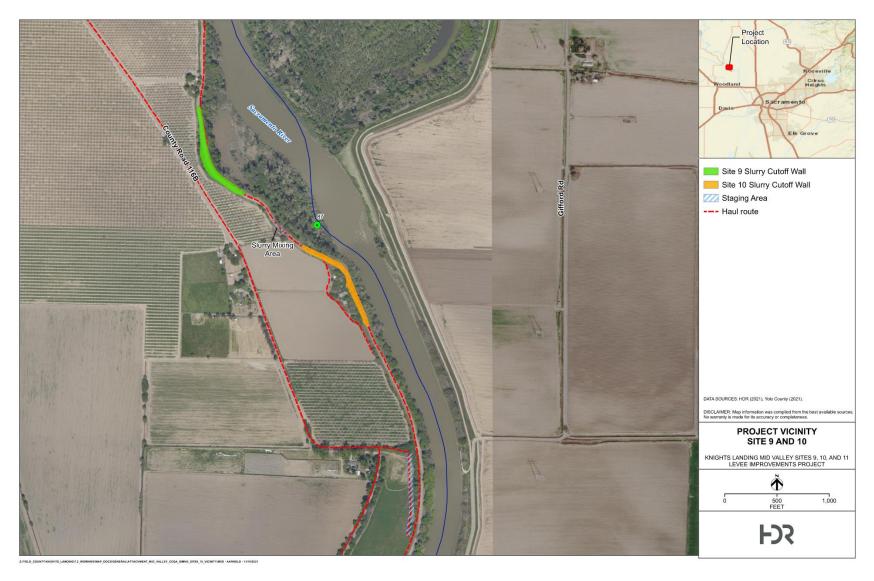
Mid-Valley Levee Reconstruction Sites 9 and 10 Project Area
